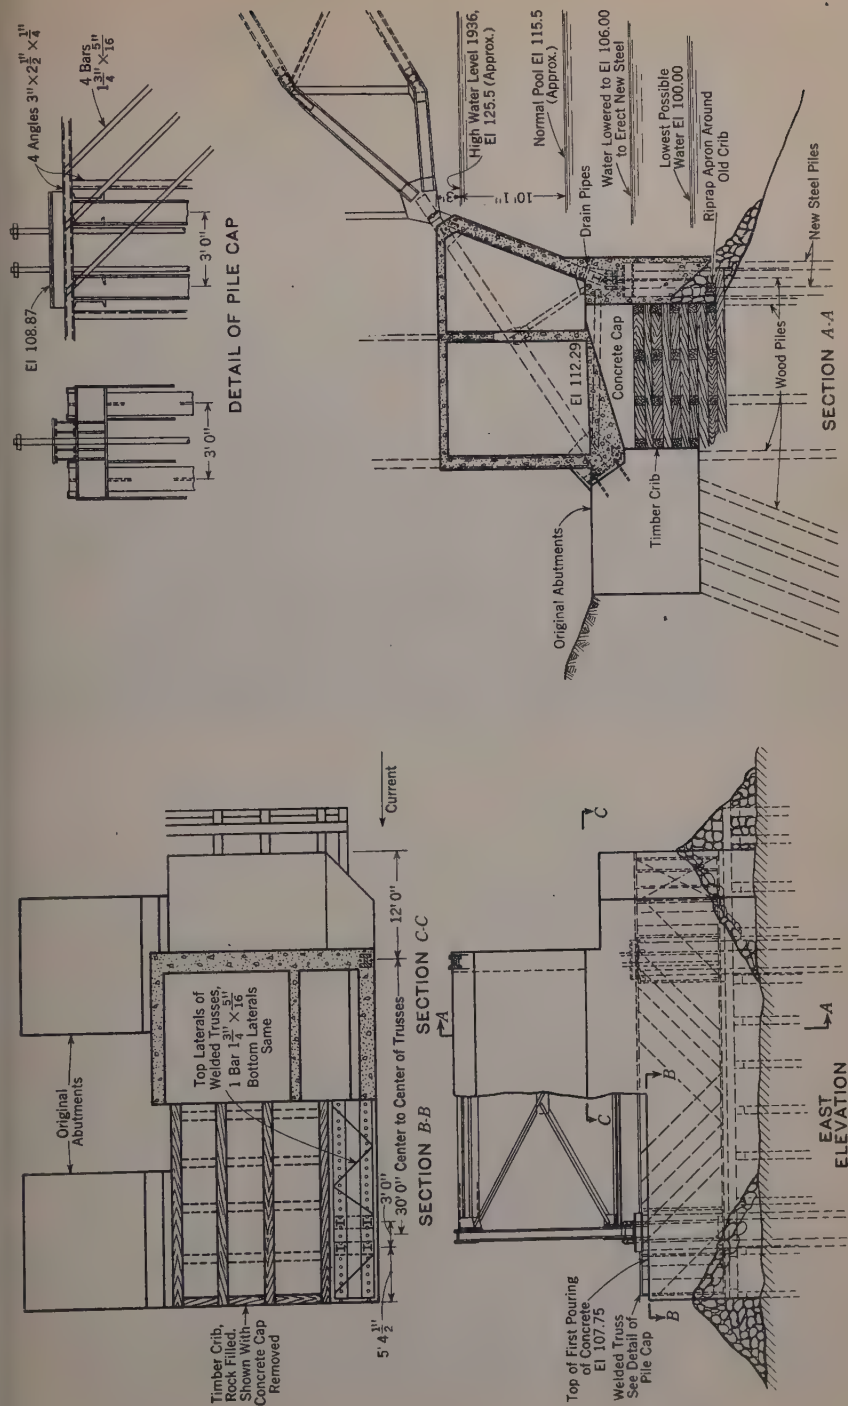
CONSTRUCTION LAYOUT OF THE VERMONT PIER
